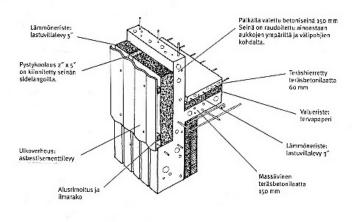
Example house 1959, exterior wall and basement roof (6, p.139)
